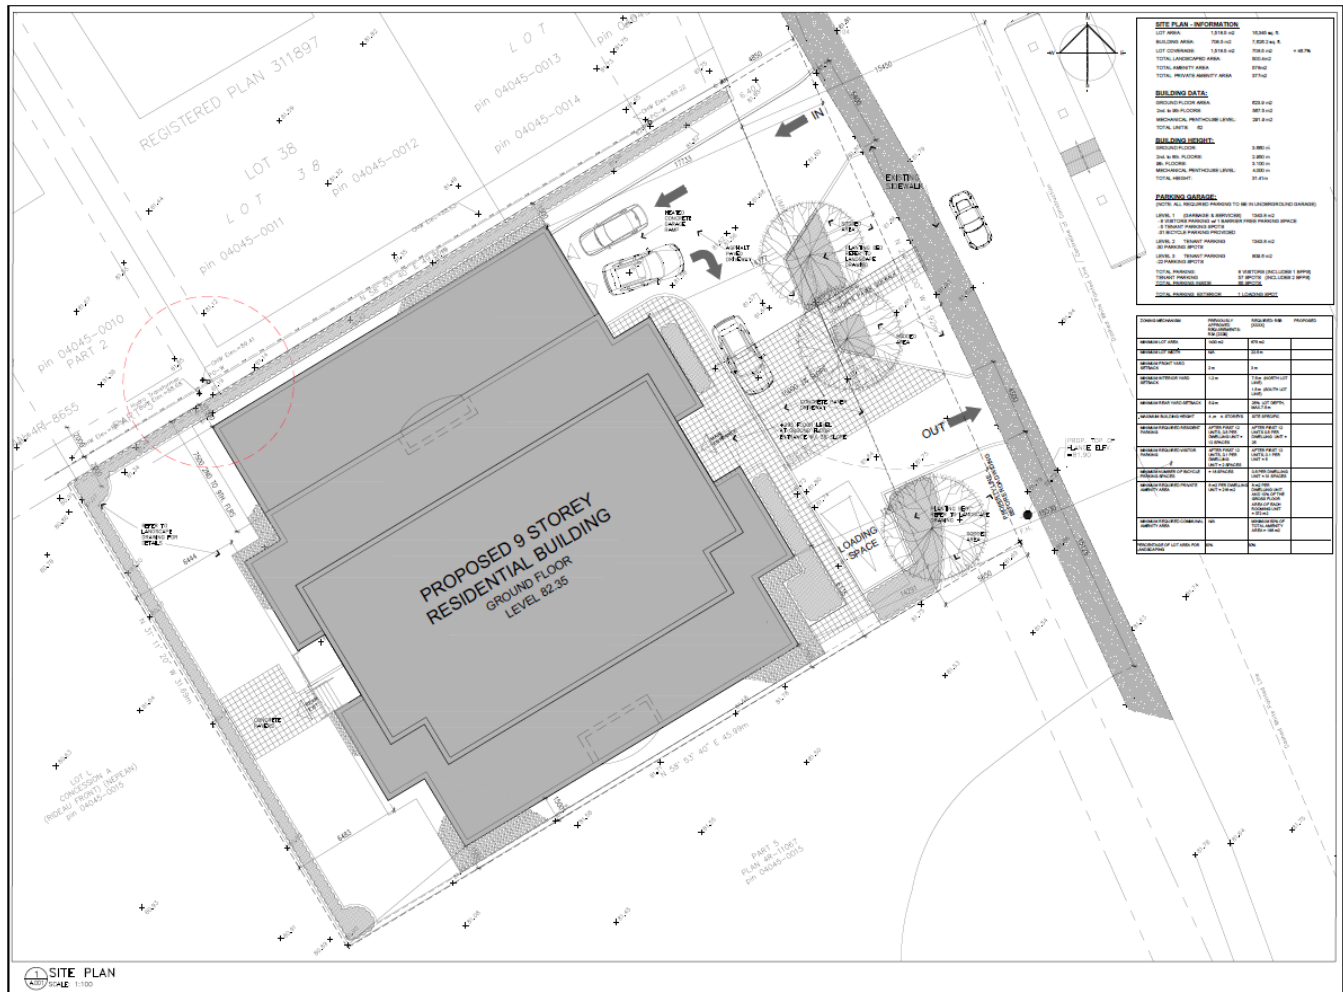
Proposed site plan for 1110 Fisher Avenue.
